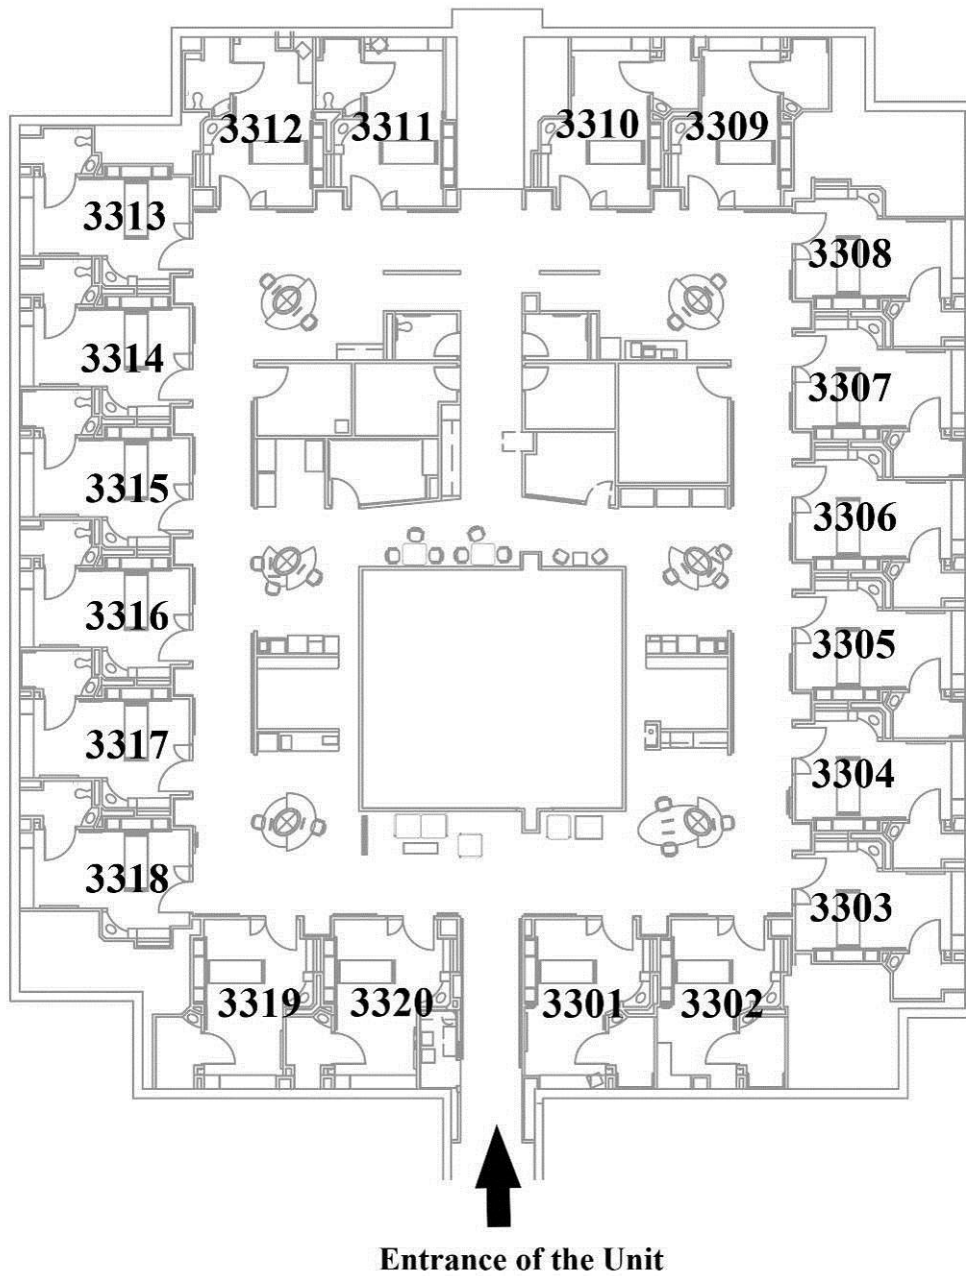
The Floor Plan of Unit 3200 with Room Numbers
